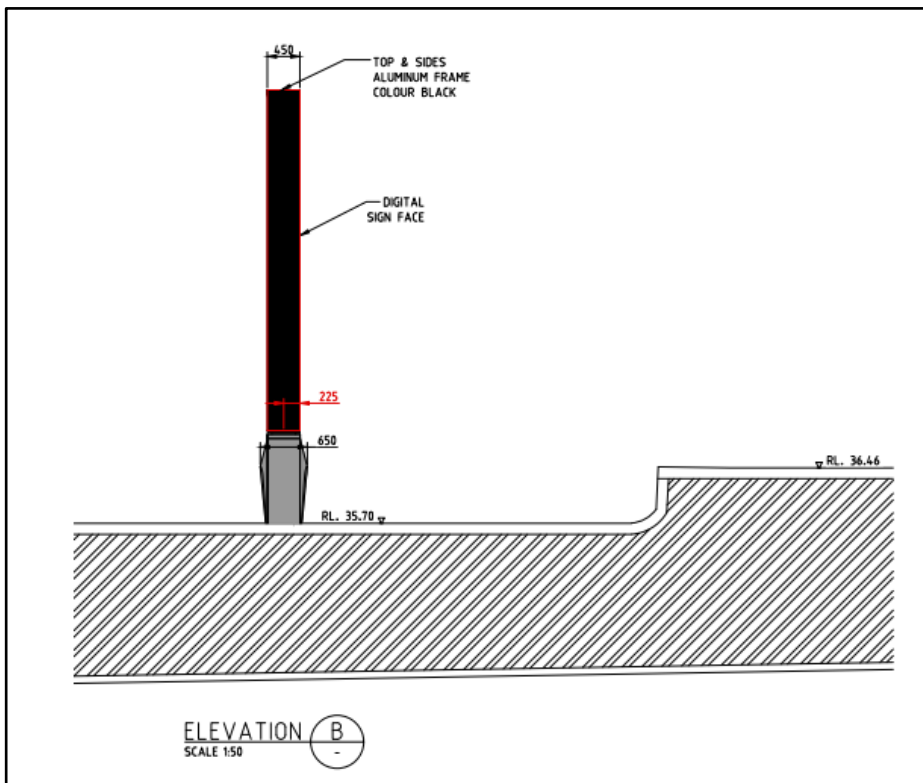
| Elevation B of proposed signage (Source: Dennis Bunt Consulting Engineers)
